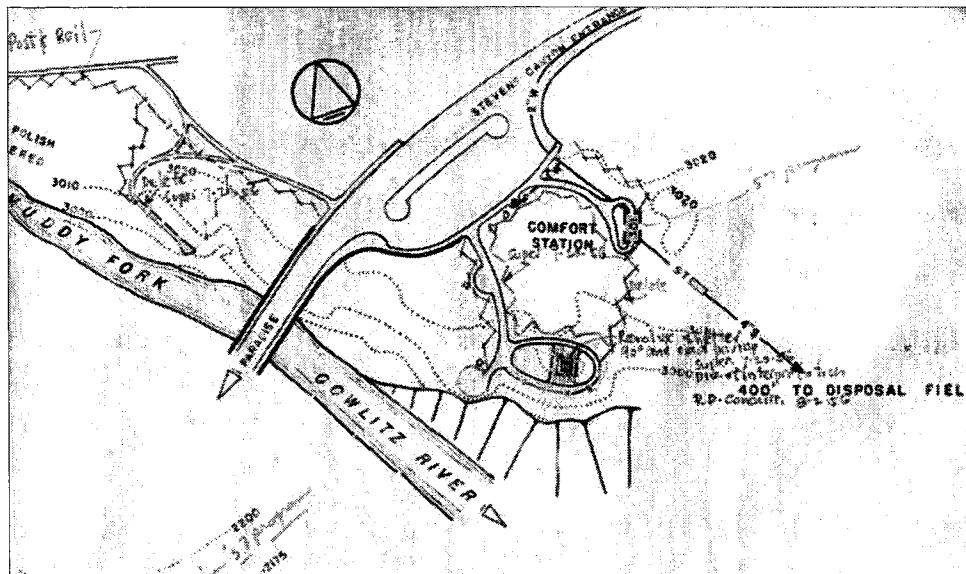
Historic plan showing proposal for Box Canyon including turnout with plant island median, comfort station, exhibit shelter and viewing overlook, 1955 (MORA Archive).
